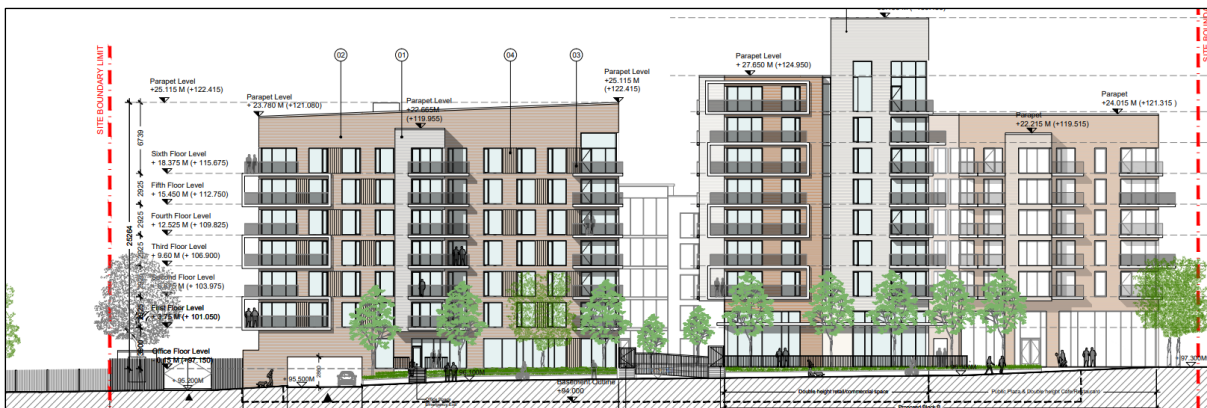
Northern elevation (fronting Airton Road) approved under ABP Ref. ABP-305763-19
